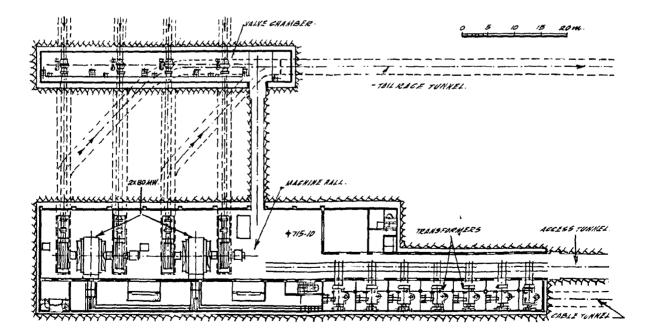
(C) PLAN OF STALDEN UNDERGROUND STATION.
